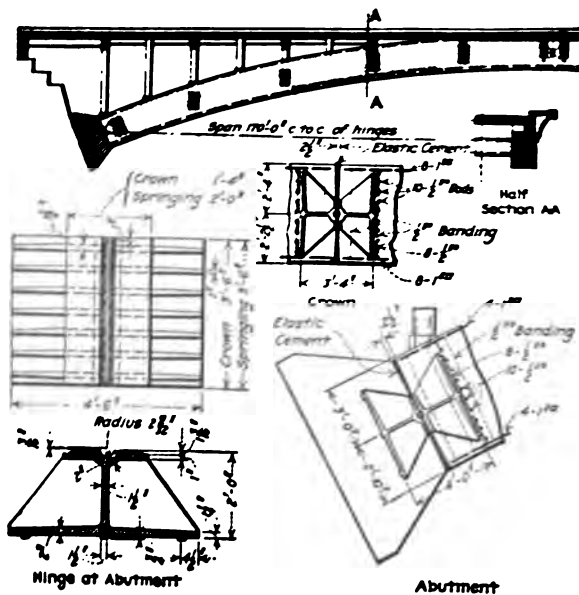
Details of Moffett Creek arch, Columbia Highway, Oregon.
